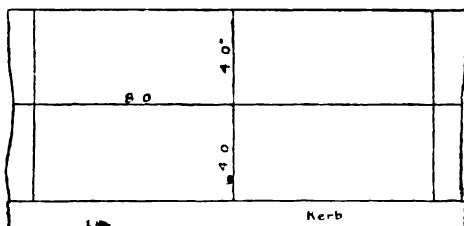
Longitudinal Straight Joints for Concrete Flagging laid in situ.
